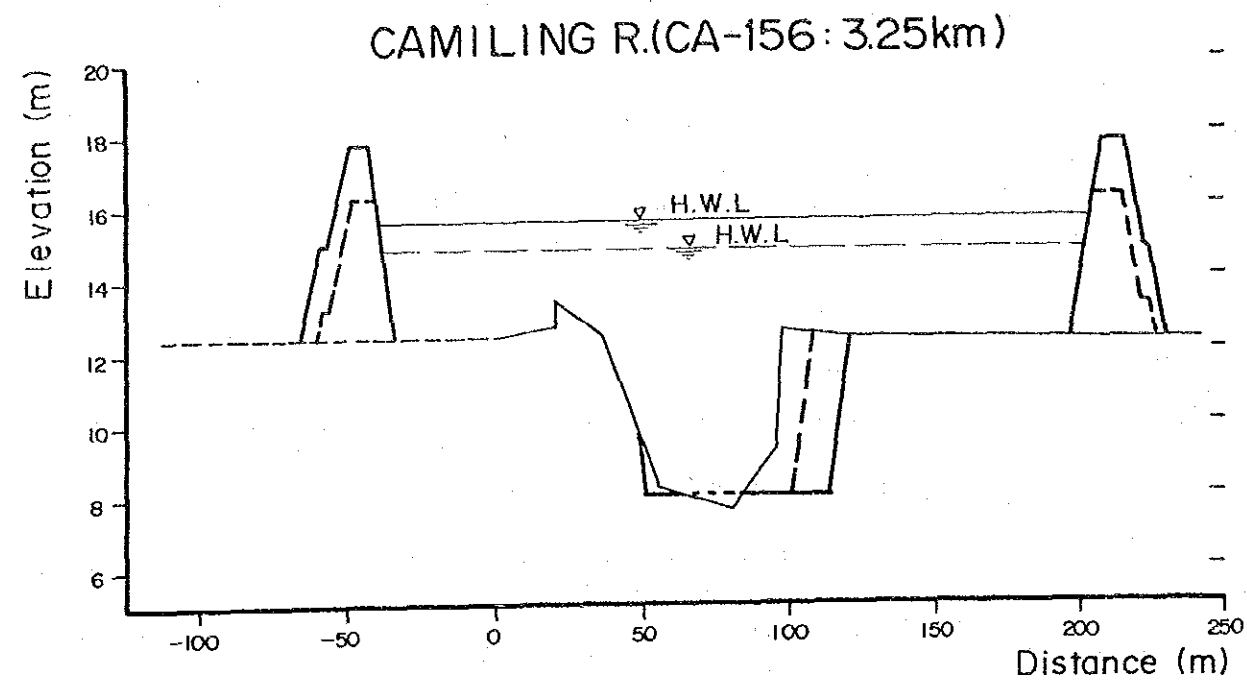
TYPICAL CROSS-SECTION OF CAMILING RIVER
